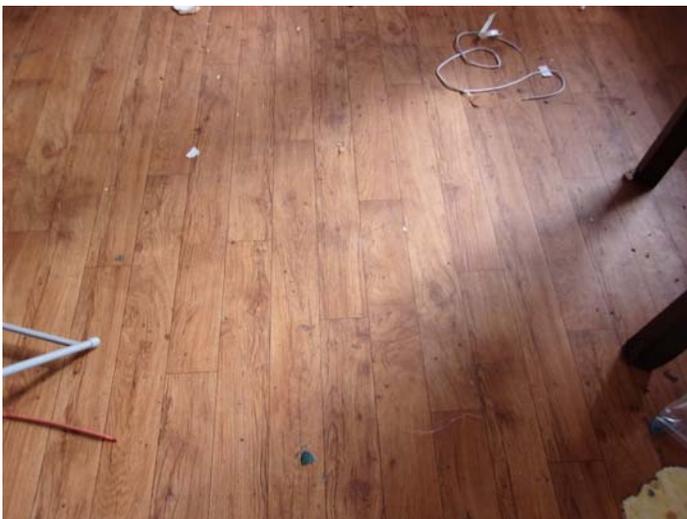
Light wood grain vinyl floor & mastic in the living room – top layer
